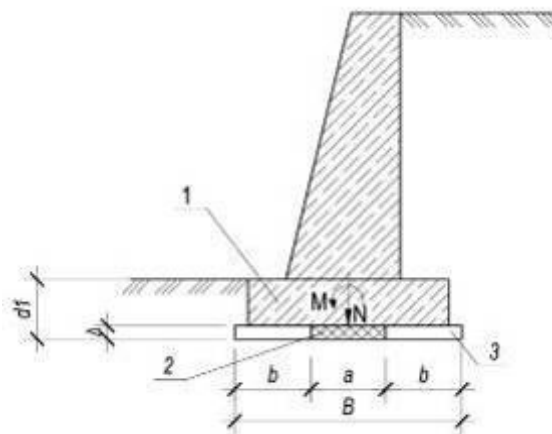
Mass retaining wall with a longitudinal centrally located cut-out on the bottom
